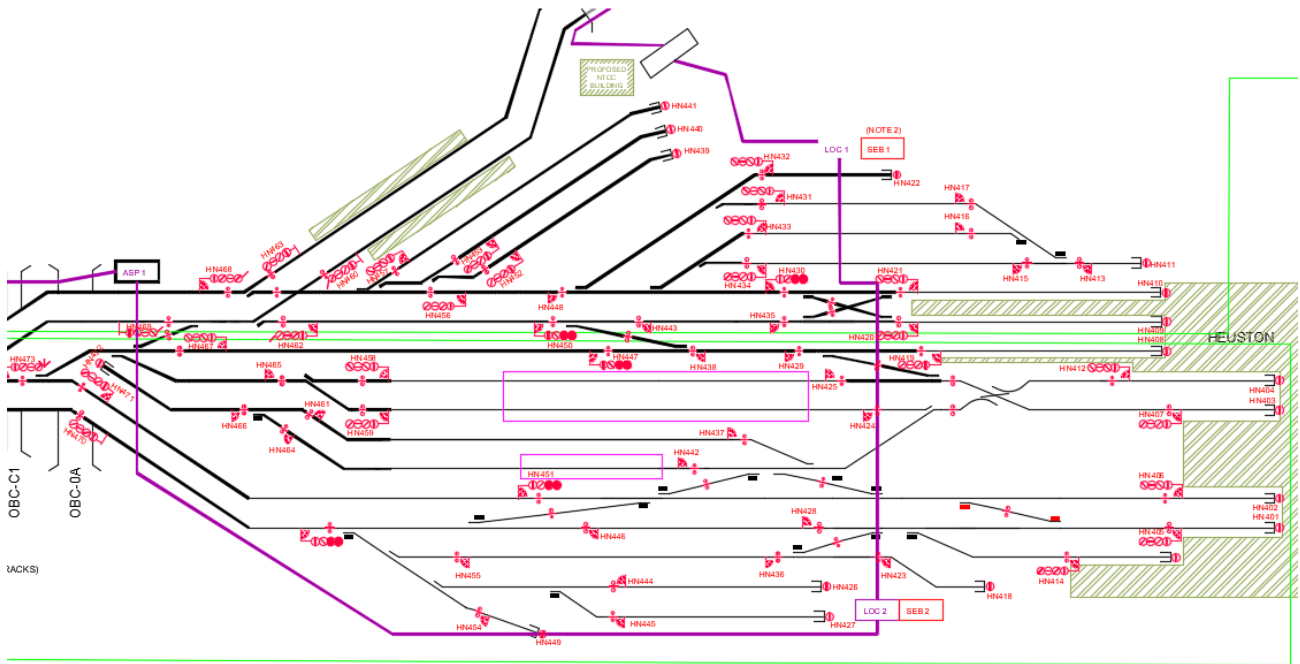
Signalling Scheme Plan (Heuston Station)
